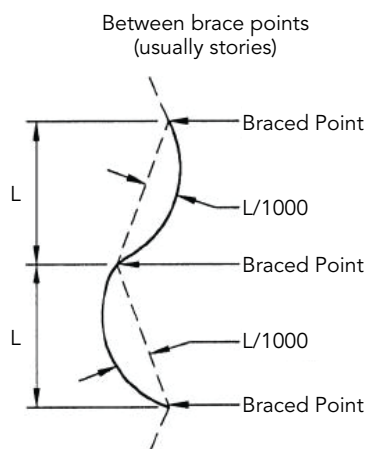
of the AISC Code of Standard Practice for Steel Buildings and Bridges.
